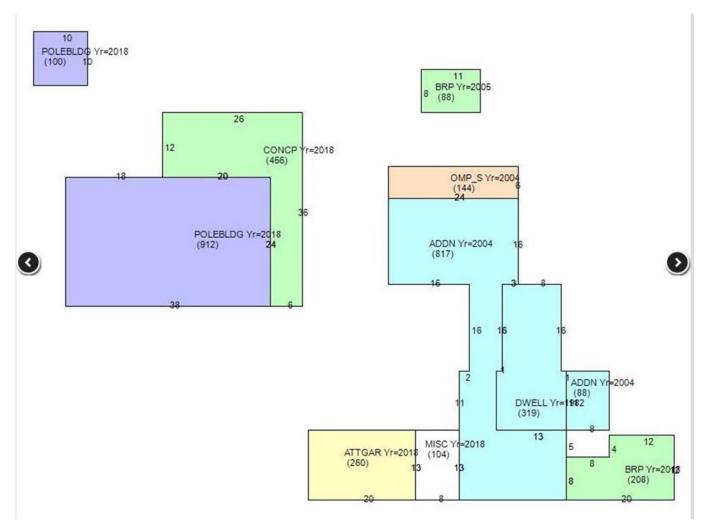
County Appraiser Guest Cottage and RV/Boat Storage floorplan
